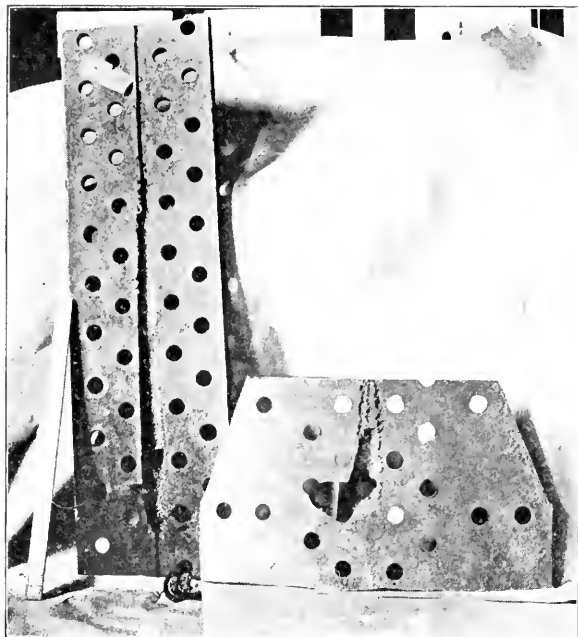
INSIDE SURFACES OF OUTER AND INNER STRAPS.
